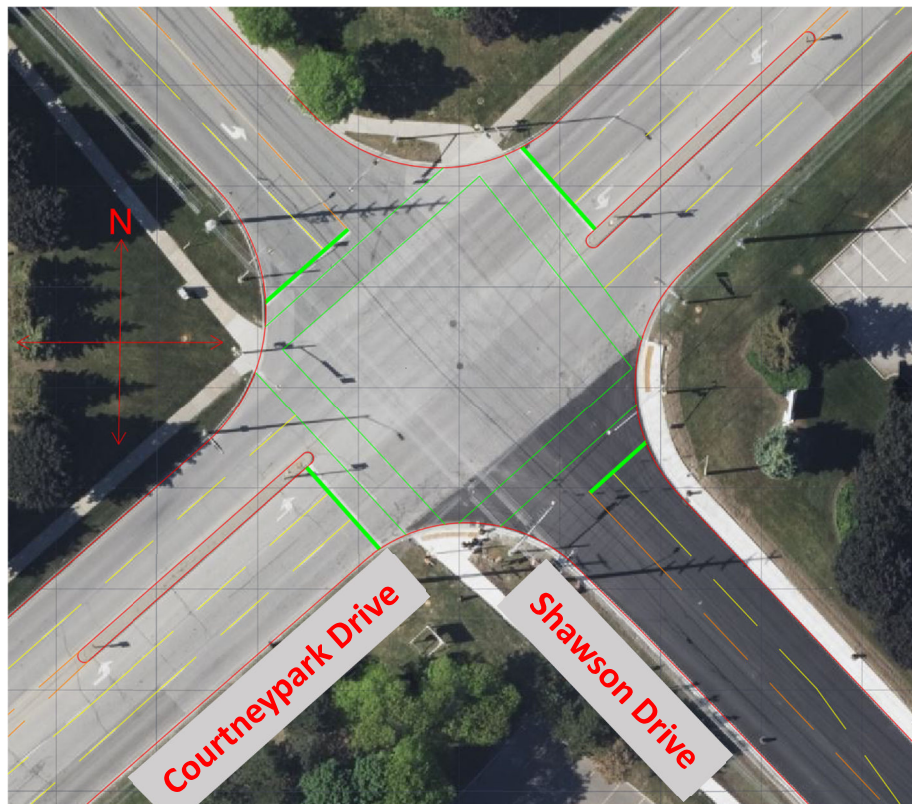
AutoCAD Drawing of Shawson Dr - Courtneypark Dr
